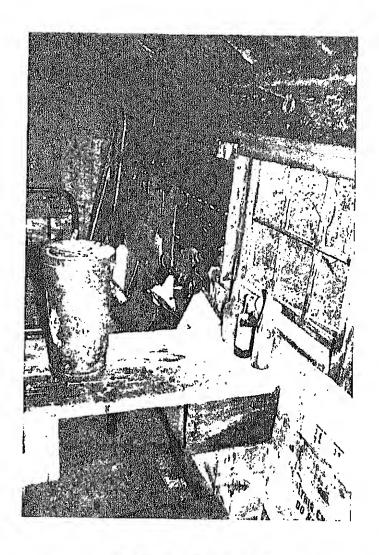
Southwest Corner 6/28/83 D.C. Anderson
